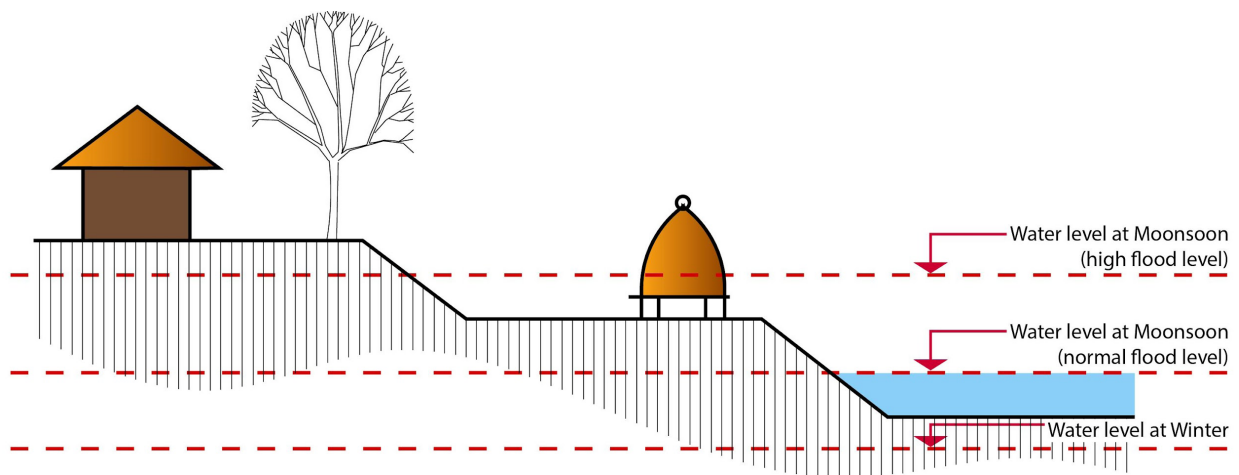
Typical land formation to ensure protection from flood to different zones of settlements.
